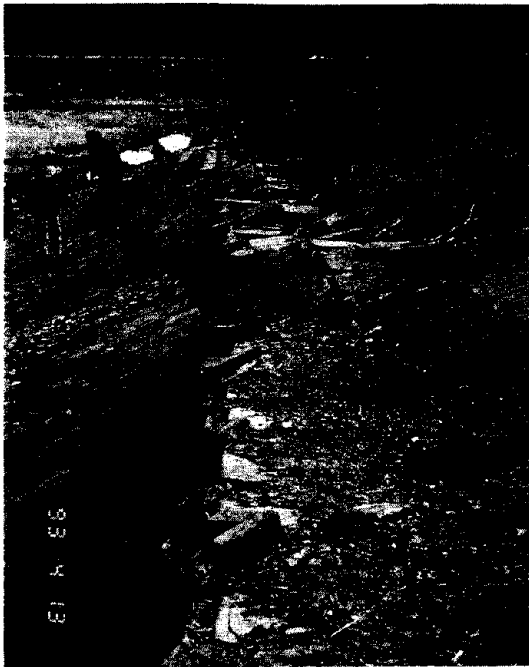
Raised Facing Concrete Blocks on the Upstream Slope Protection of Mombetsu Dam
